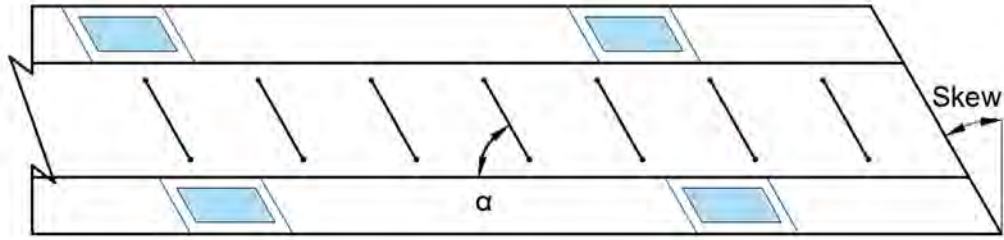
Plan View of 30 Degrees Skewed ITBC
